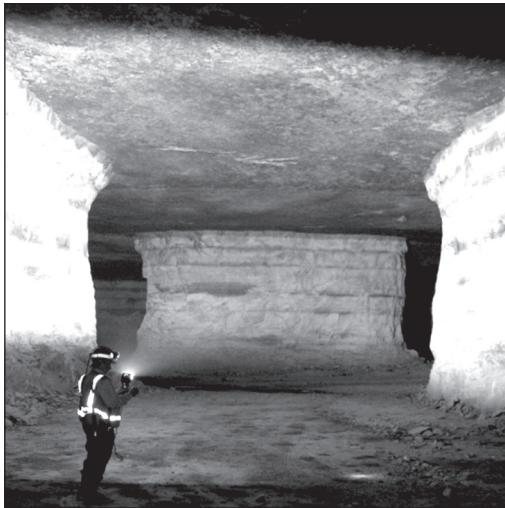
Naturally stable 13-m (44-ft) wide roof span in a stone mine
